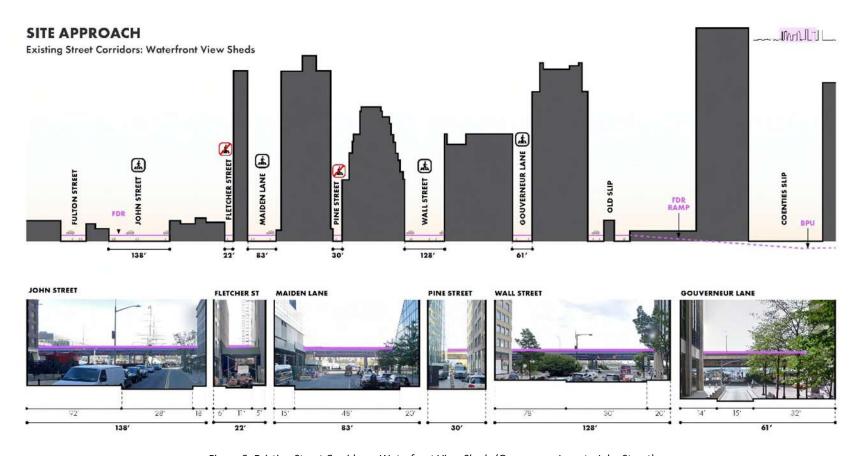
Existing Street Corridors - Waterfront View Sheds (Gouverneur Lane to John Street)
